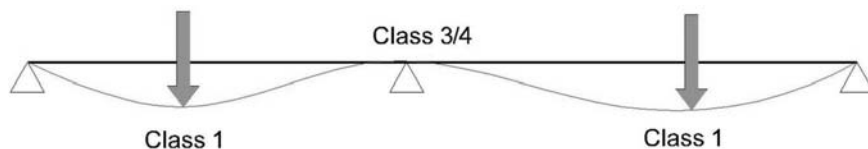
Typical classification of cross-sections for long-span composite bridges [6]
